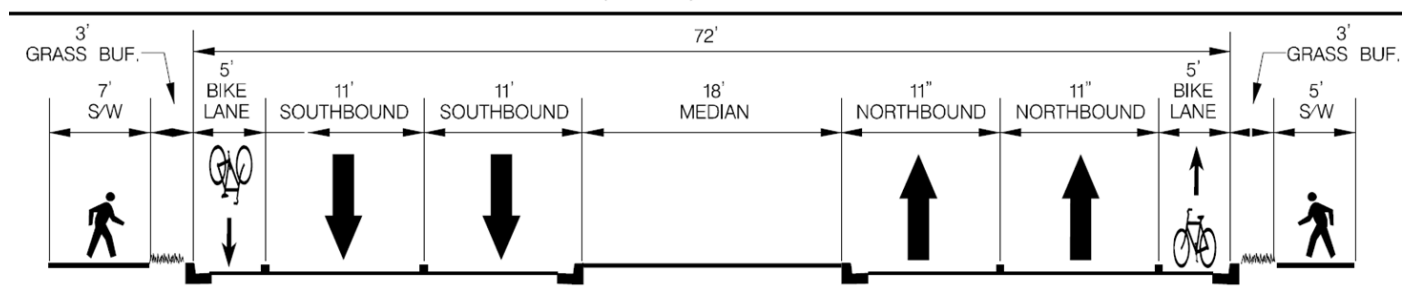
Proposed Cross-section for Ridge Road from Watts Ave to Bear Paw Ln.
